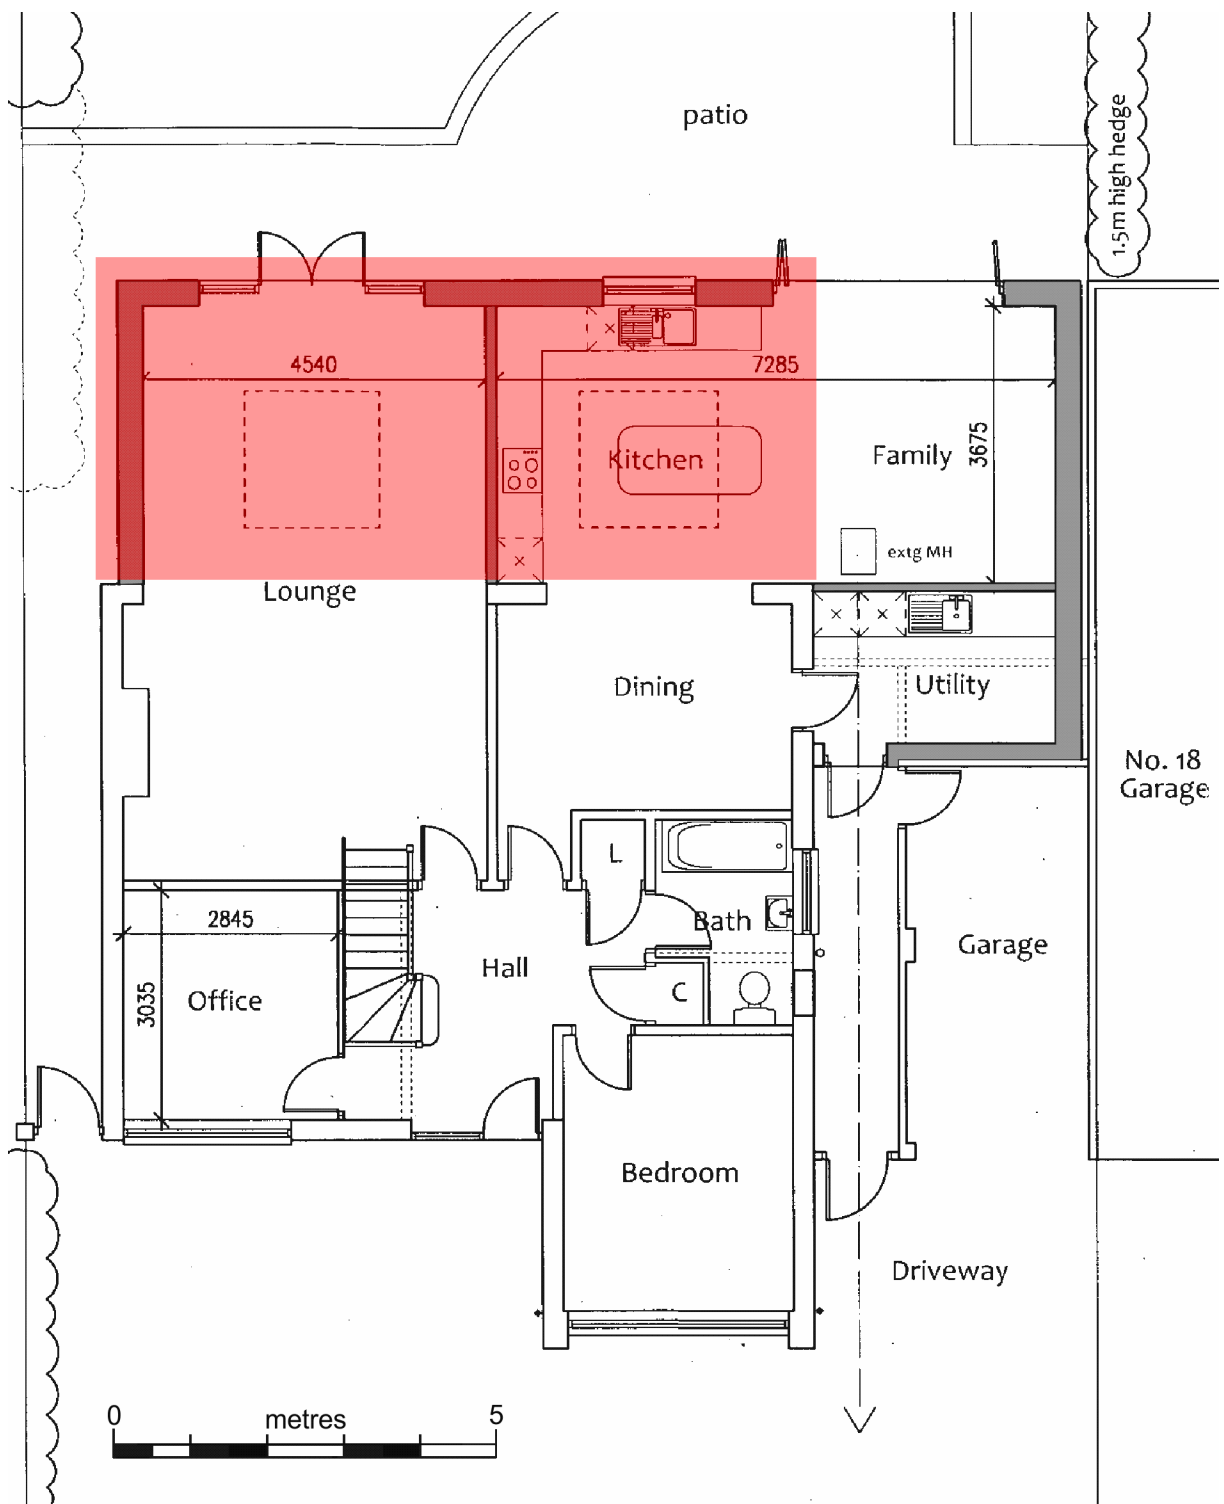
Proposed development, and extent of monitoring (*scale 1:100*)
